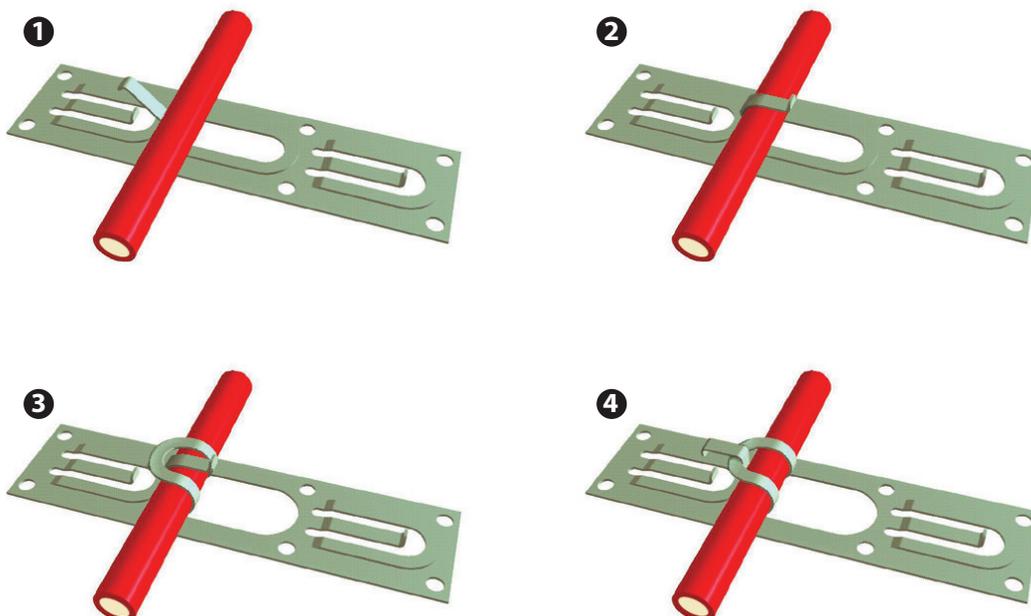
Fitting band installed in parallel to a 2 m wall.
